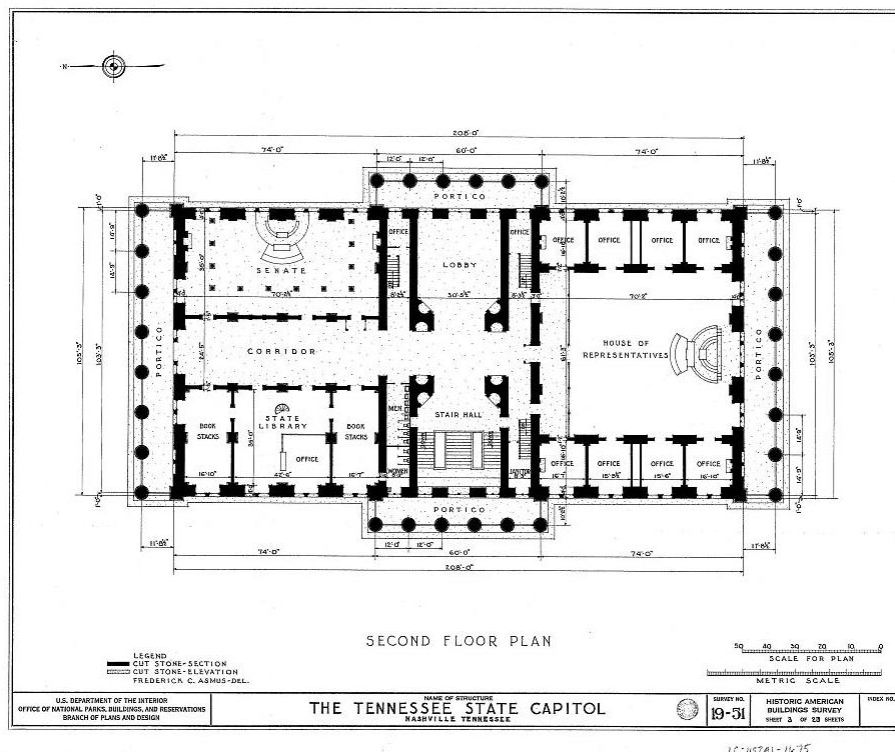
Tennessee State Capitol, Second Floor Plan (HABS)
